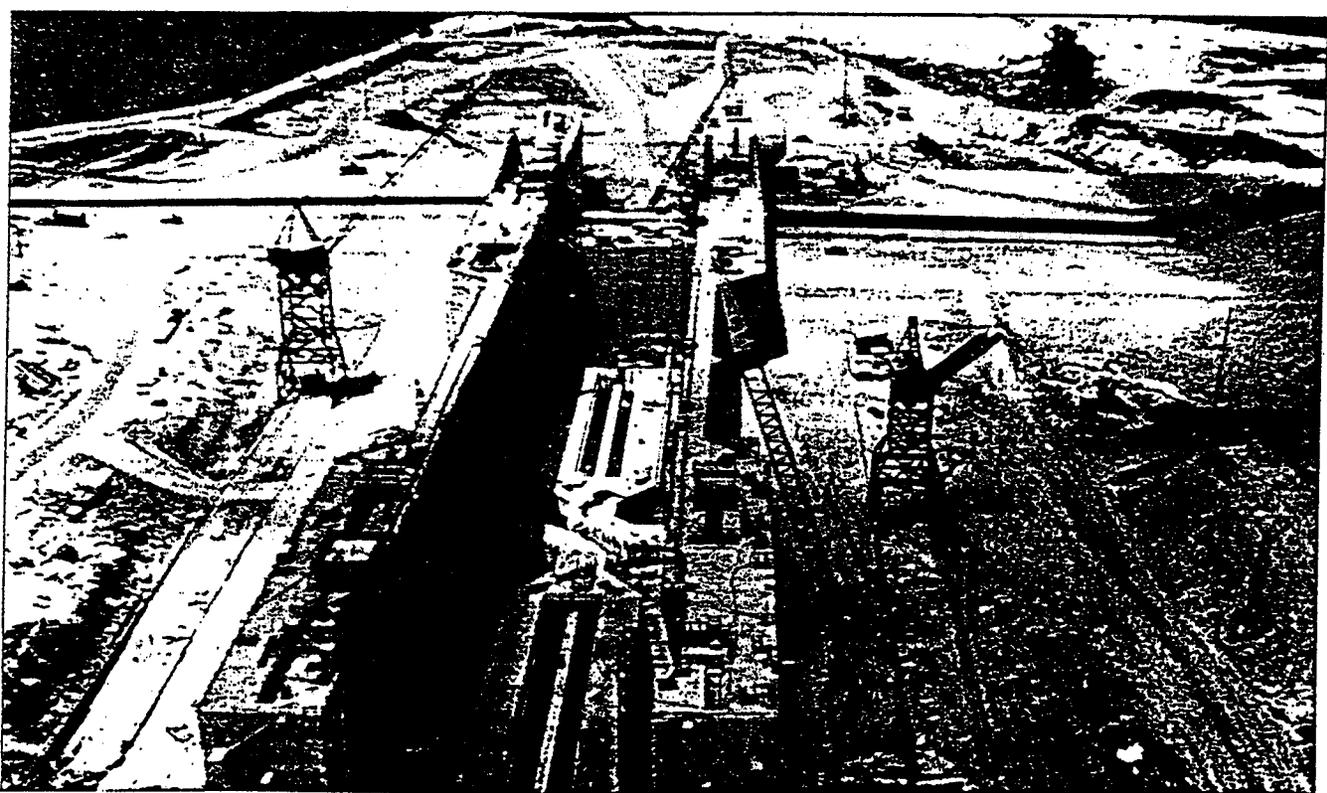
Bay Springs Lock under construction, Tennessee-Tombigbee Waterway (U.S. Army, Corps of Engineers, Nashville District).
